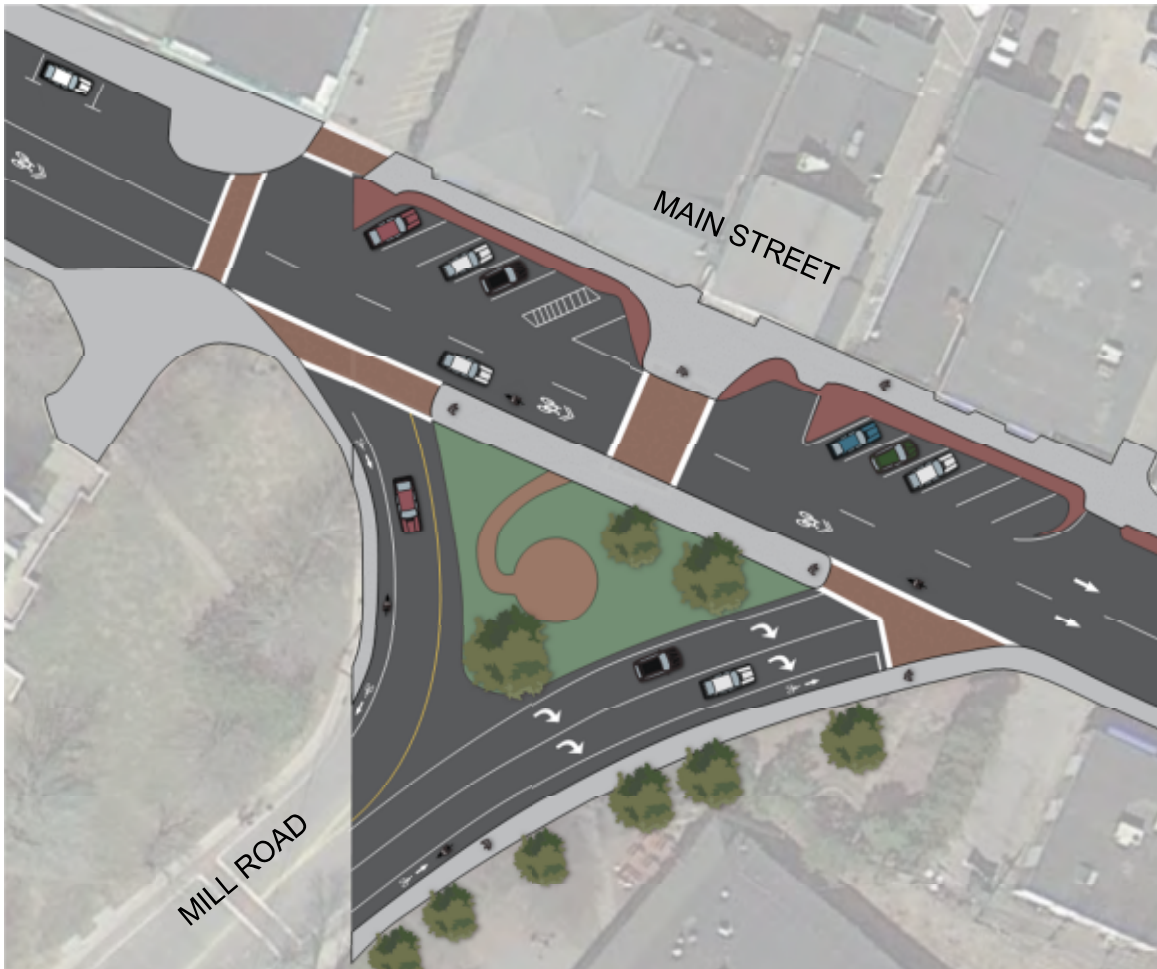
RECOMMENDED BICYCLE LANE INTERSECTION CROSSING MARKINGS
